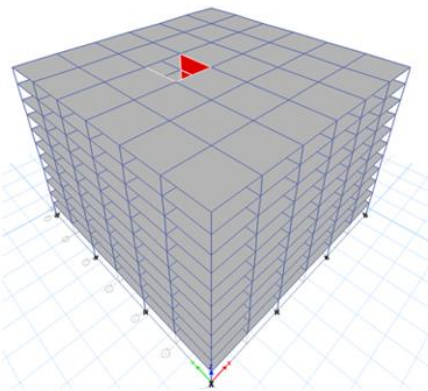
3-D view of Building with Floating Column along with Shear Wall
